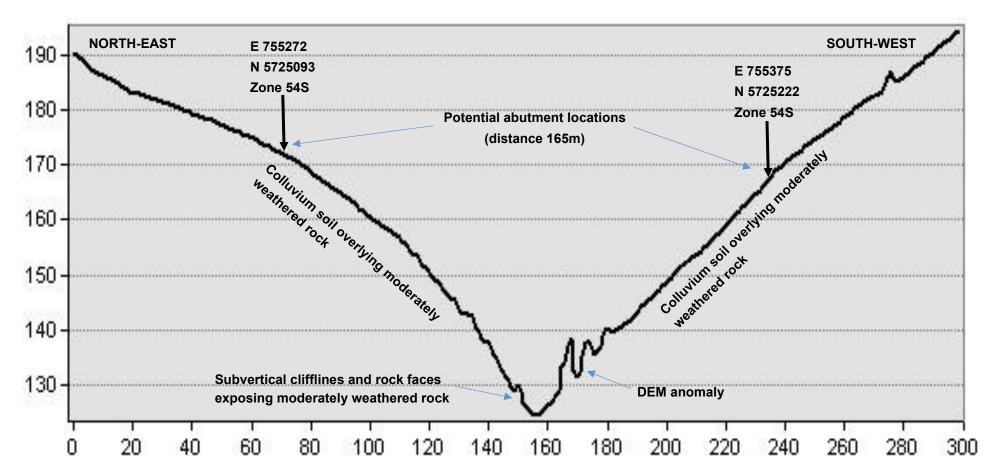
Cross section along proposed Bridge 5 indicating potential abutment locations
